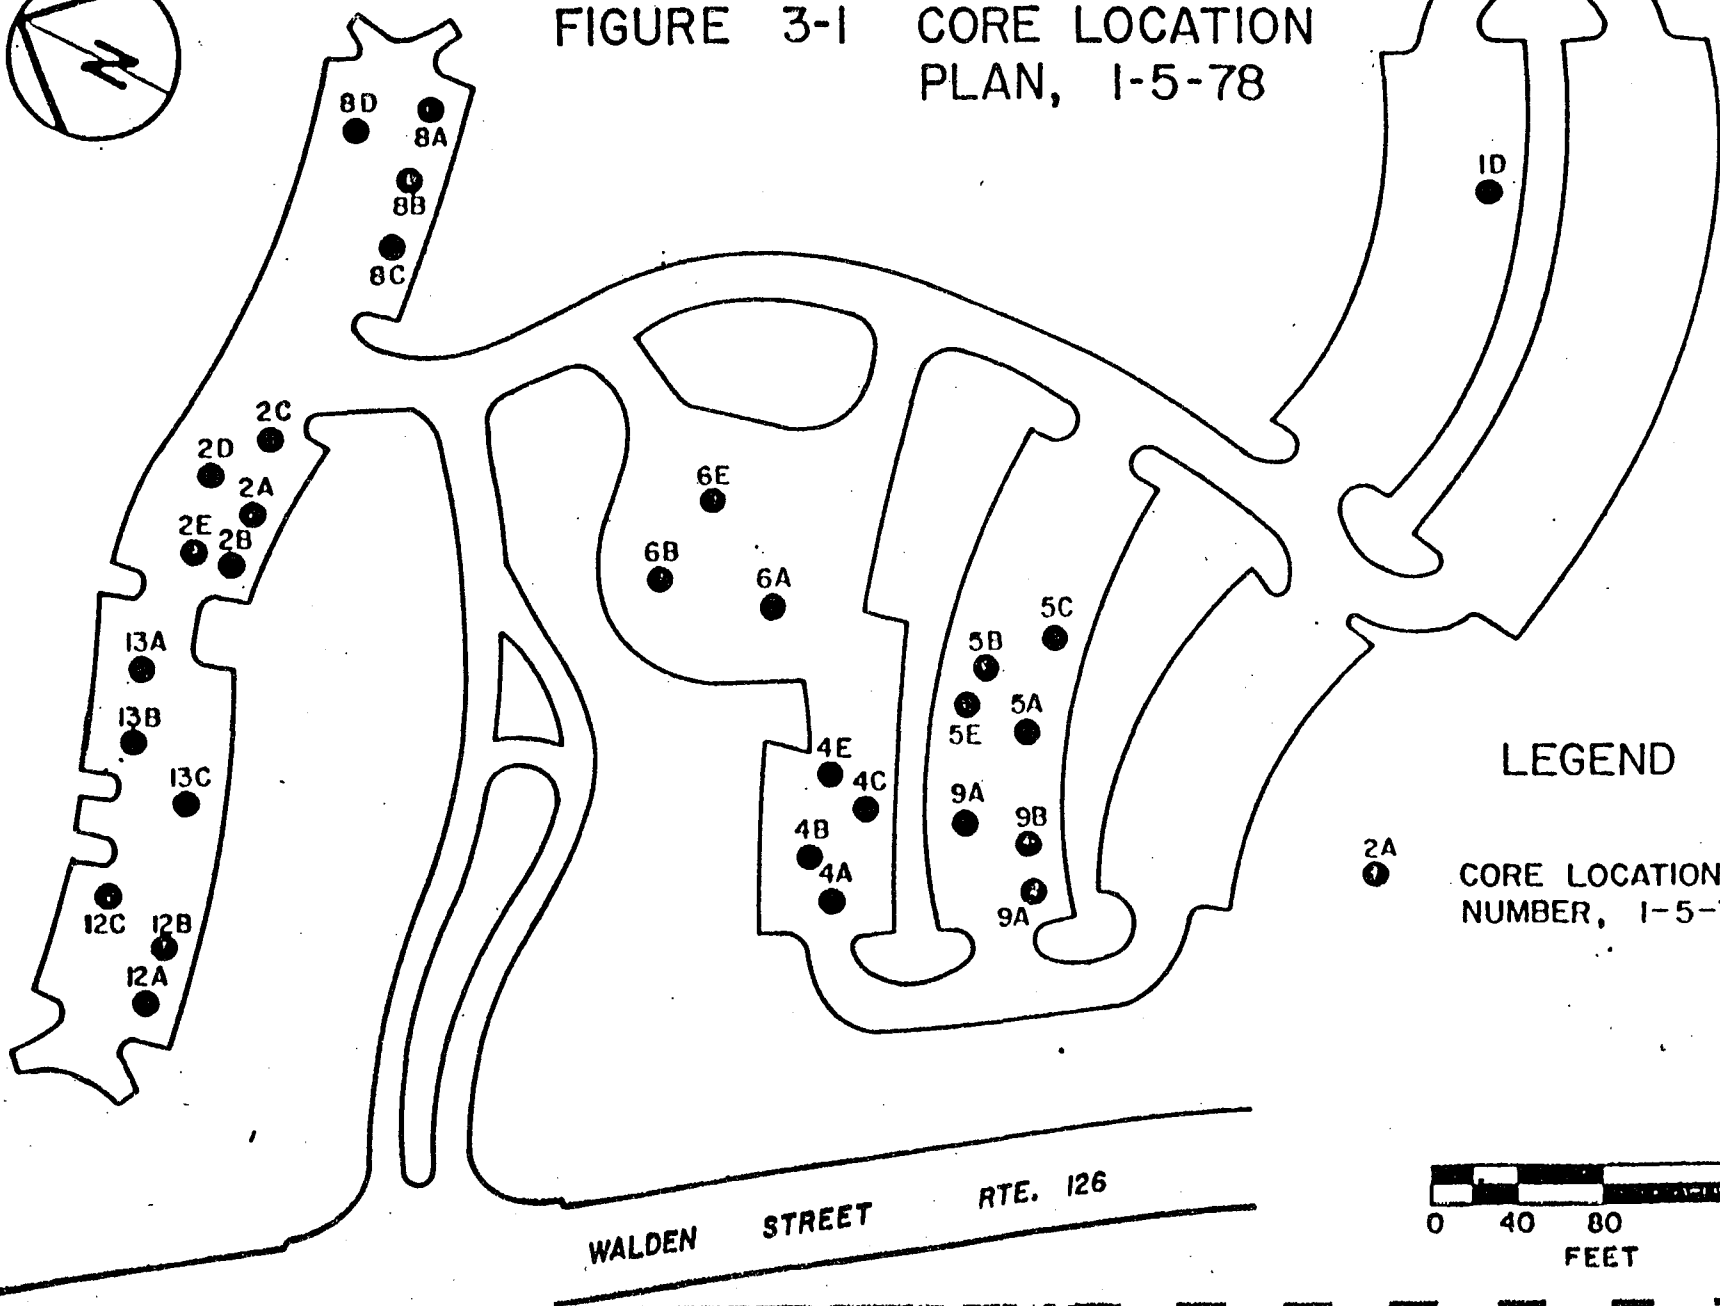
CORE LOCATION PLAN, 1-5-78
